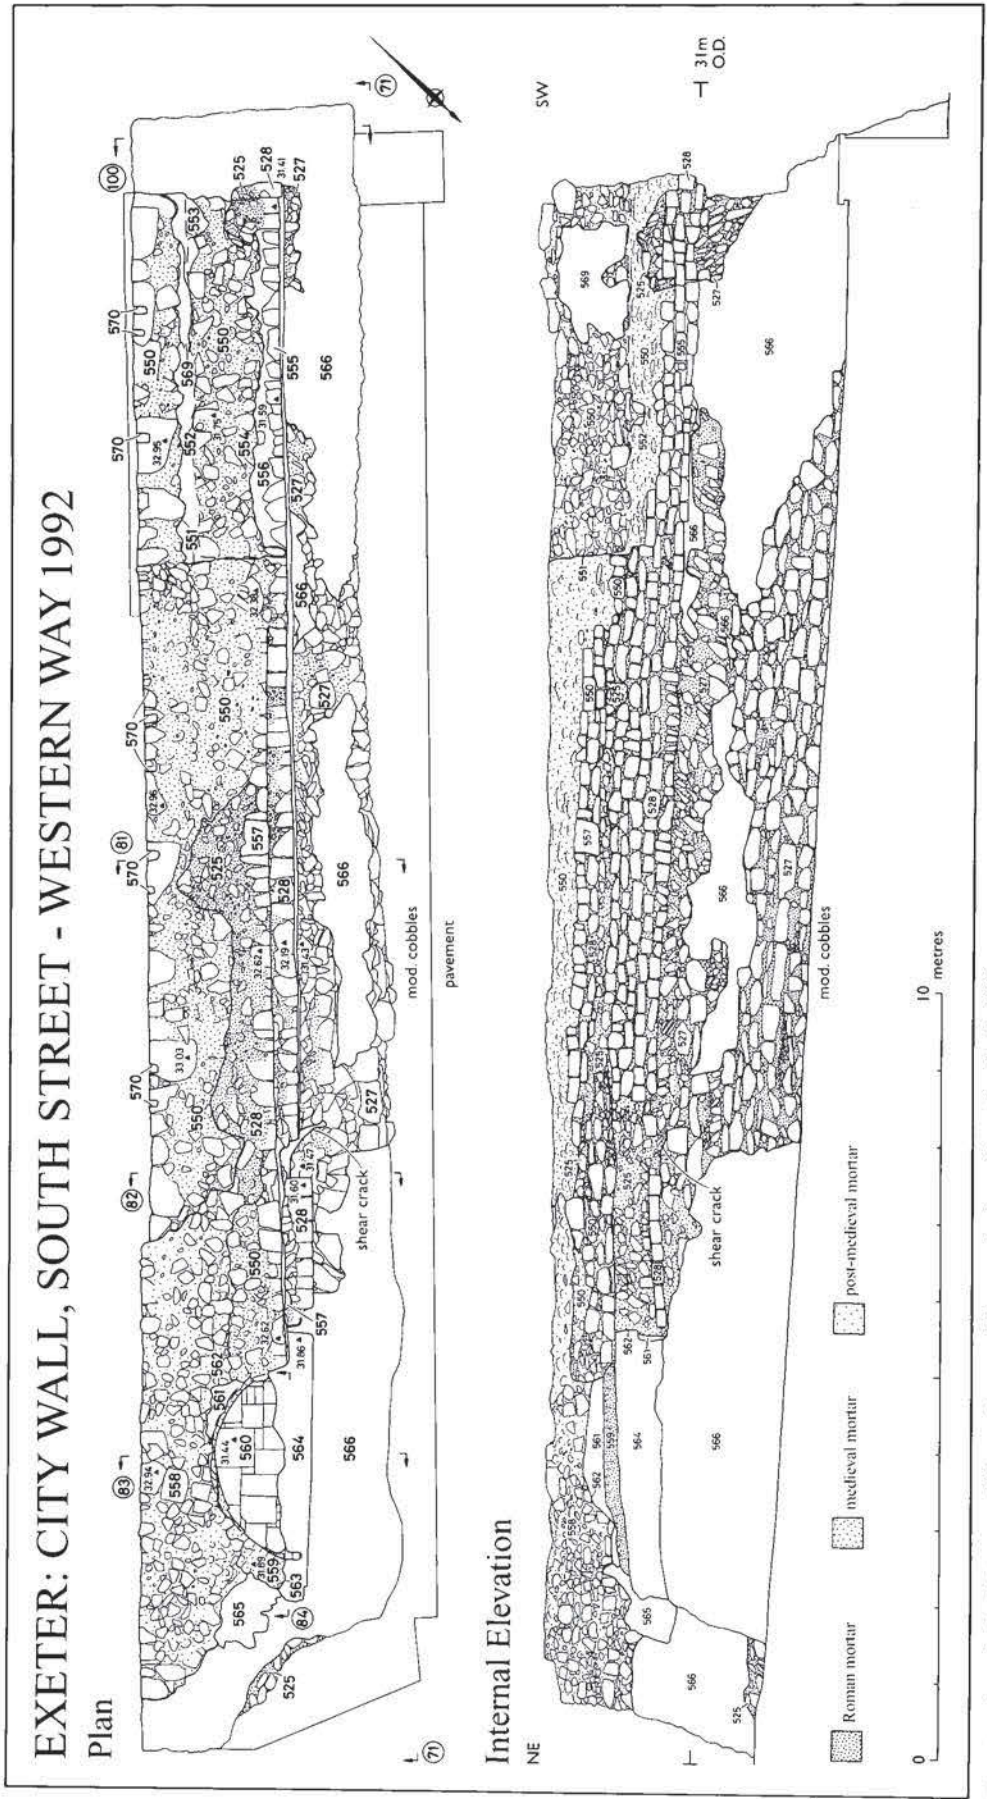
South St-Western Way, plan and internal elevation. Scale 1:100.
